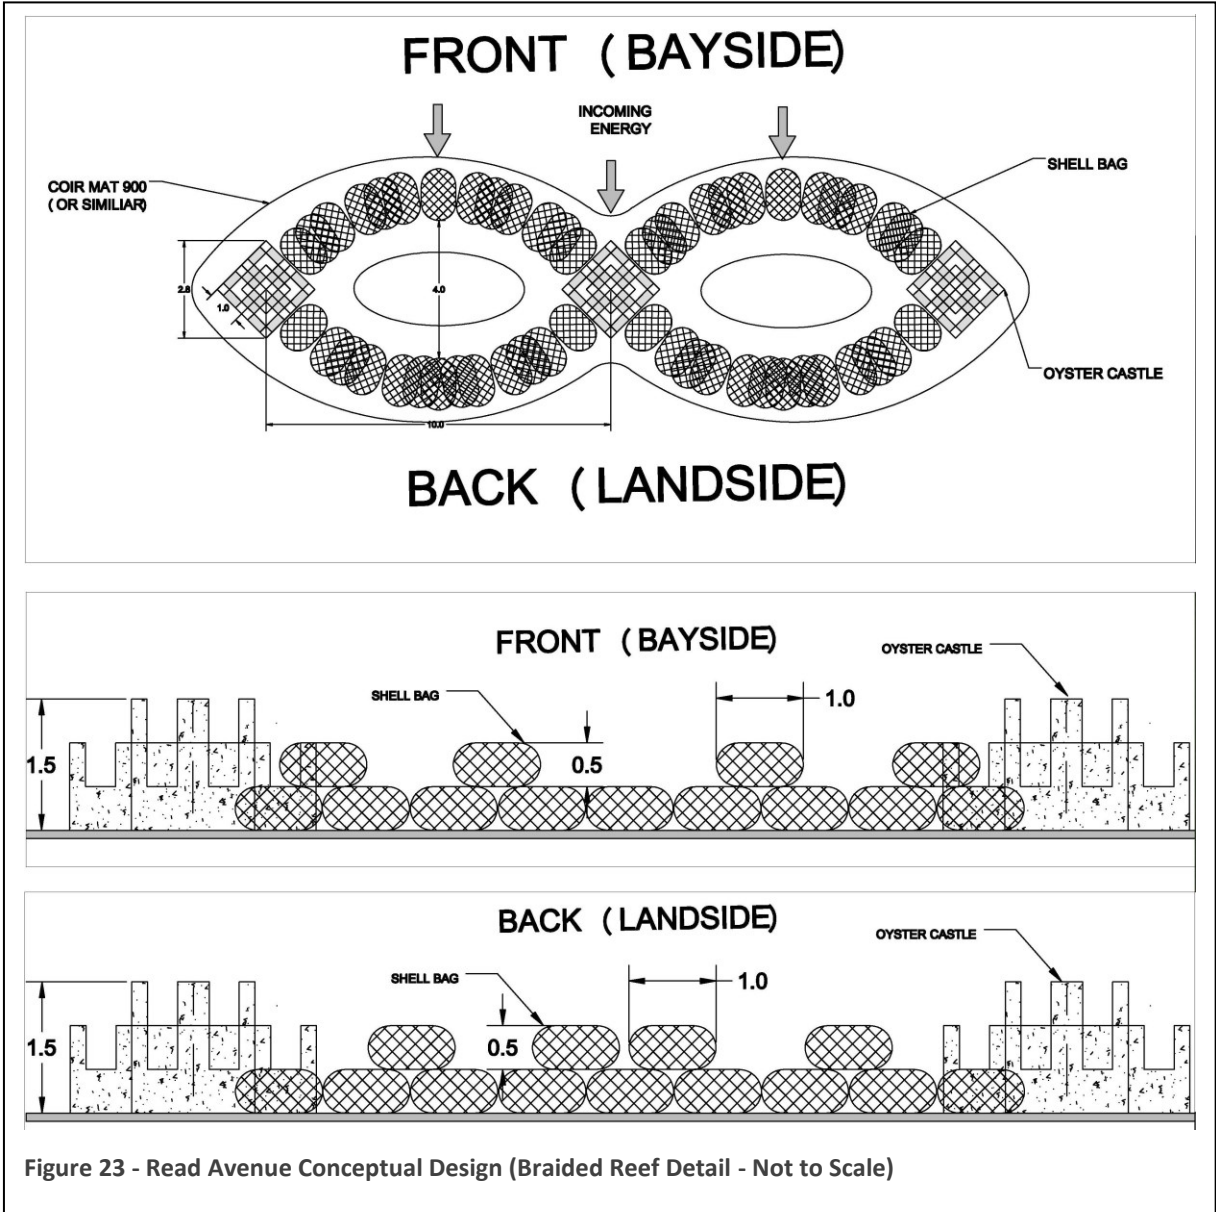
Read Avenue Conceptual Design (Braided Reef Detail - Not to Scale)
